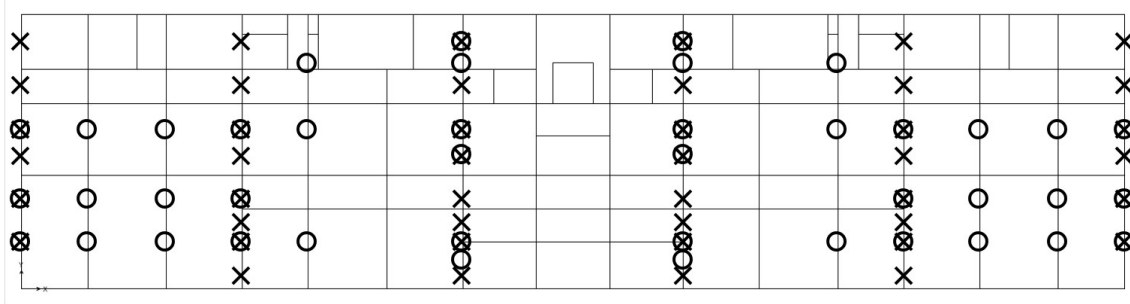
Damper Placement at 3rd floor (R-Y); MSSSA: 44 dampers;
